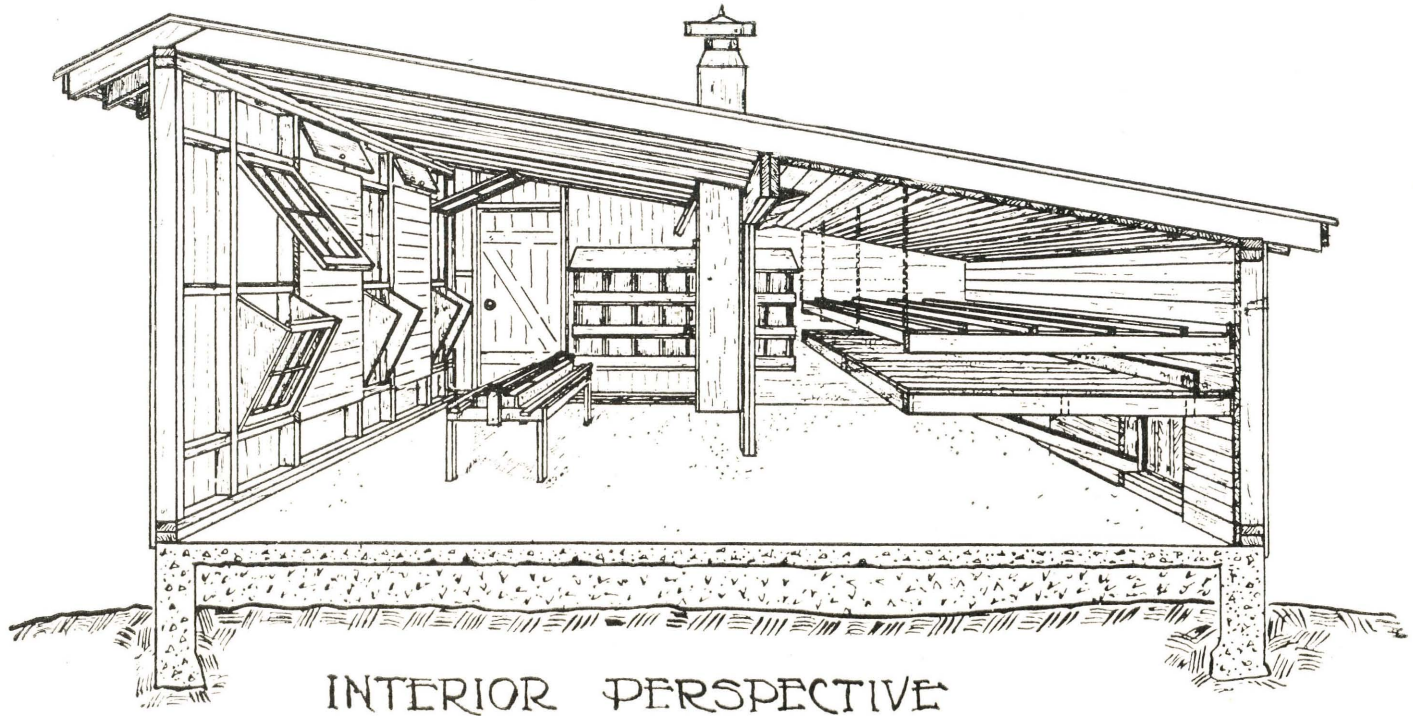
Interior perspective. The equipment is arranged to give as much clear floor space as possible. The roosts are suspended in front from the ceiling, and the dropping boards are braced to the foundation, giving more clear floor space.
